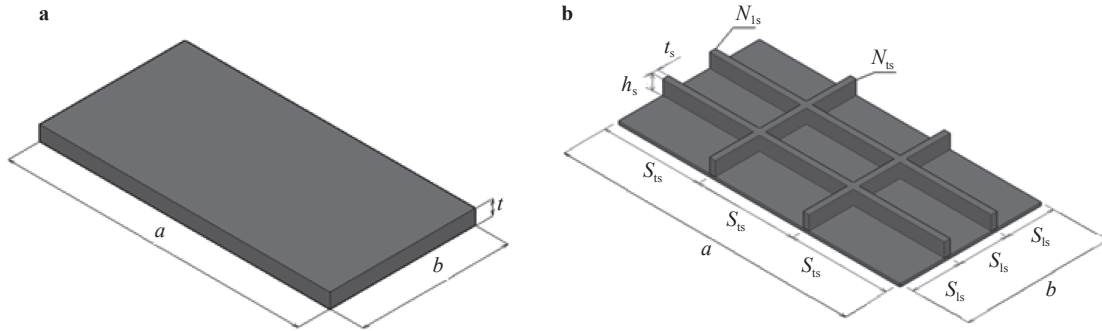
Constructural design application: a reference plate and b stiffened plate P(2, 2)
